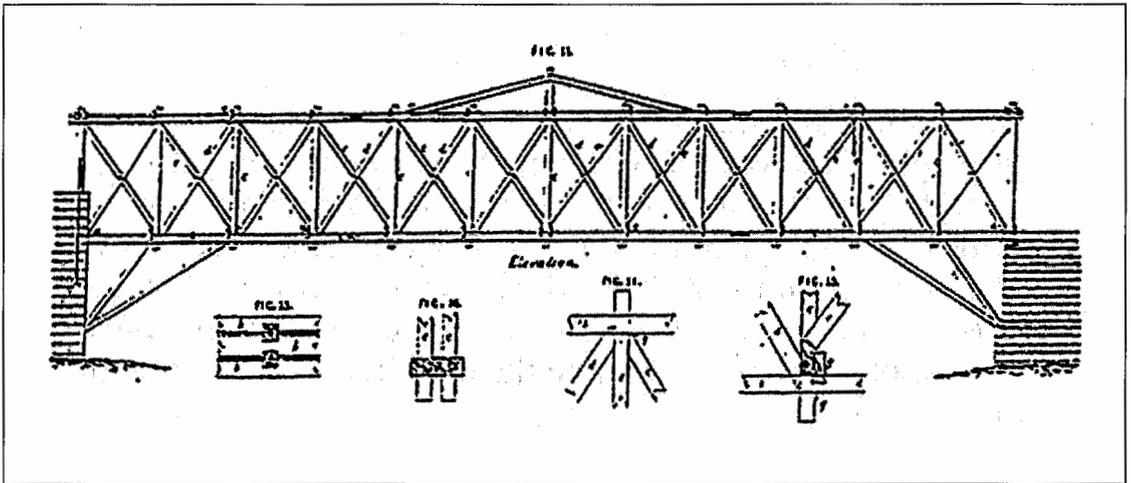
Long's 1830 Jackson Bridge with struts.
